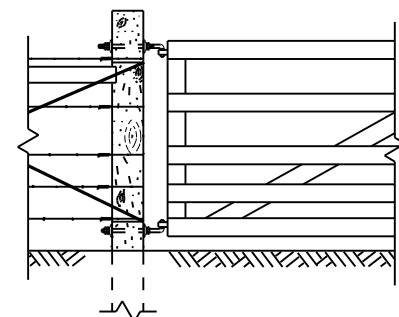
DETAIL OF GATE HINGE BOLT ASSEMBLY
